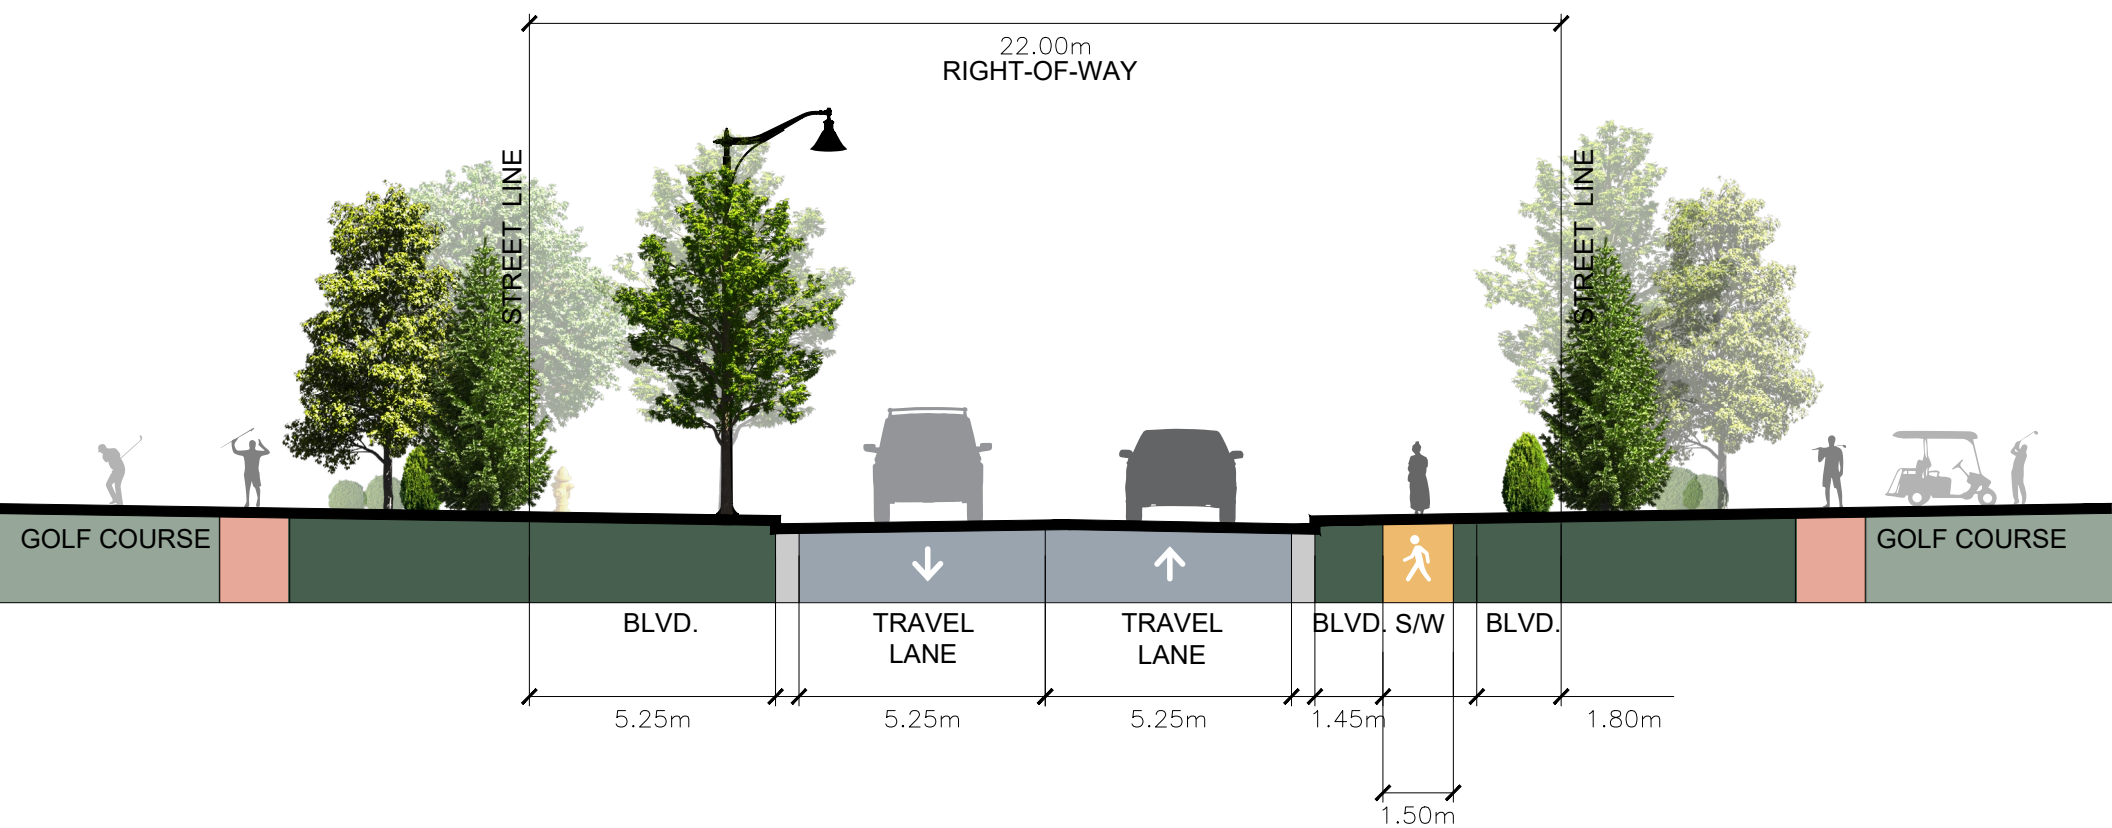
A-A' Lora Bay Phase 4B Street 'A' (22.0m) R.O.W Cross Section
